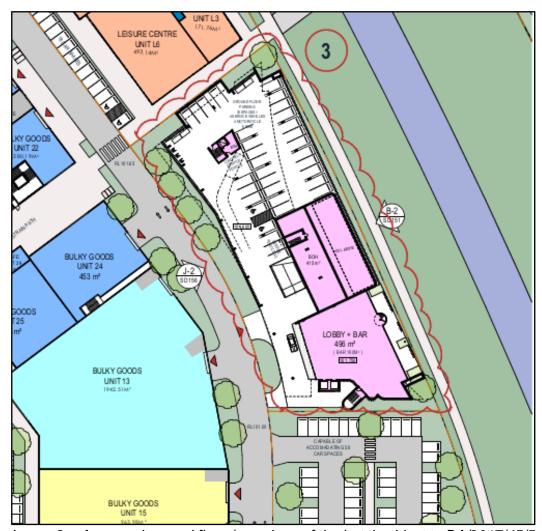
Approved ground floor / envelope of the hotel subject to DA/2017/45/5.
